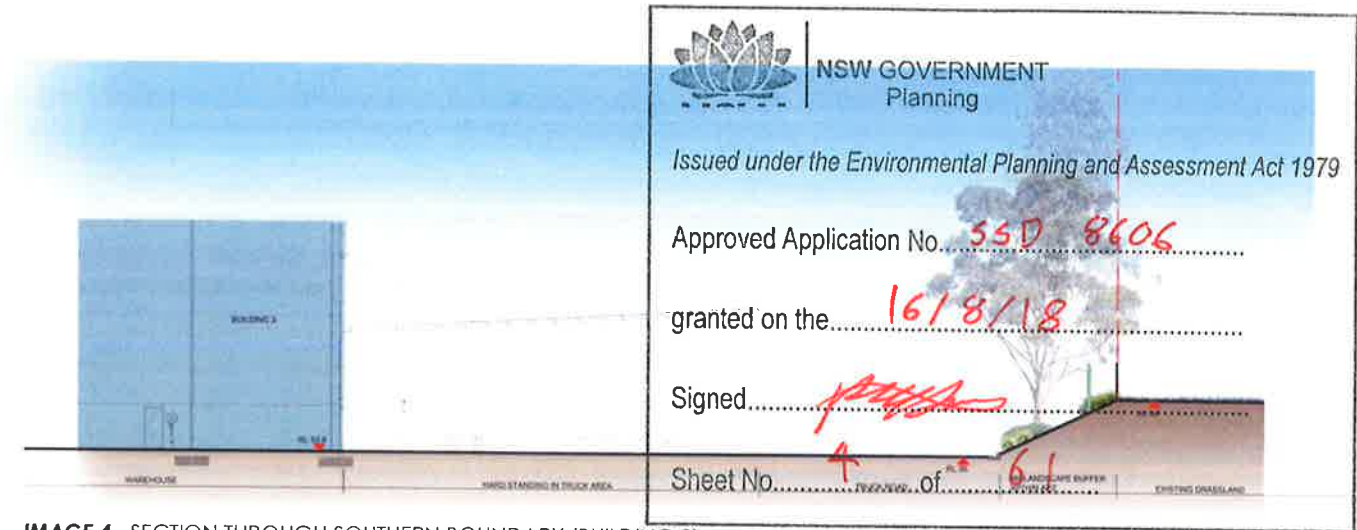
SECTION THROUGH SOUTHERN BOUNDARY (BUILDING 3)
